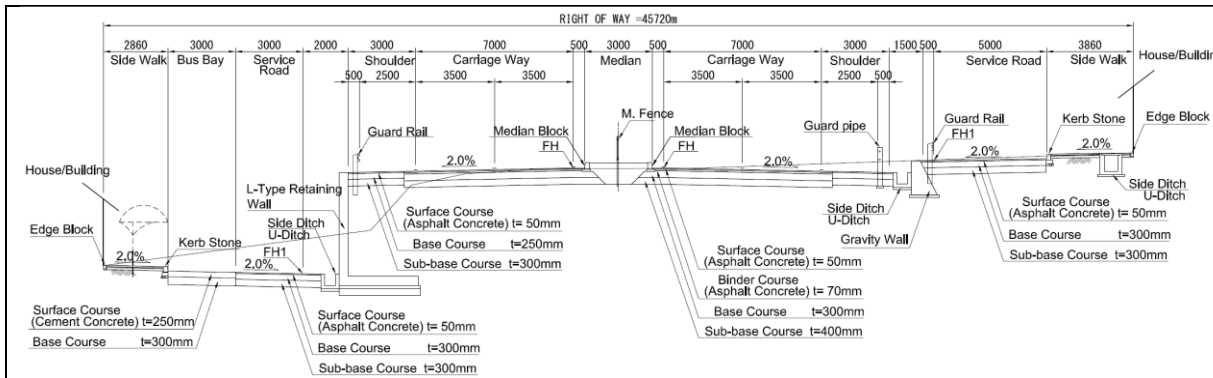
Typical Cross Section at Level Difference Sections (Section 1, Section 2)
